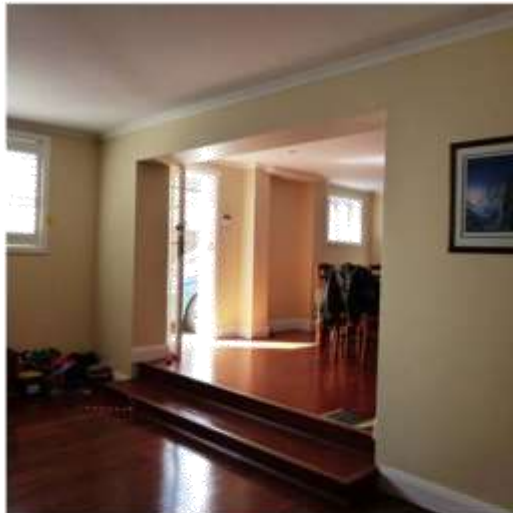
| Lower level connection of modern addition to original house. The external door leads to the driveway. The floor height is elevated in the original section of the house.
